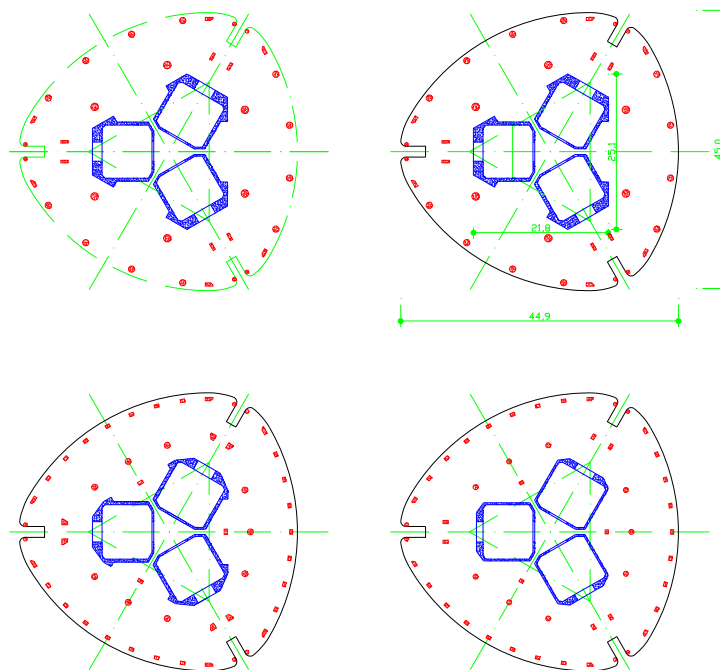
Typical floor plan of basement, low-, mid- and high-rise section
